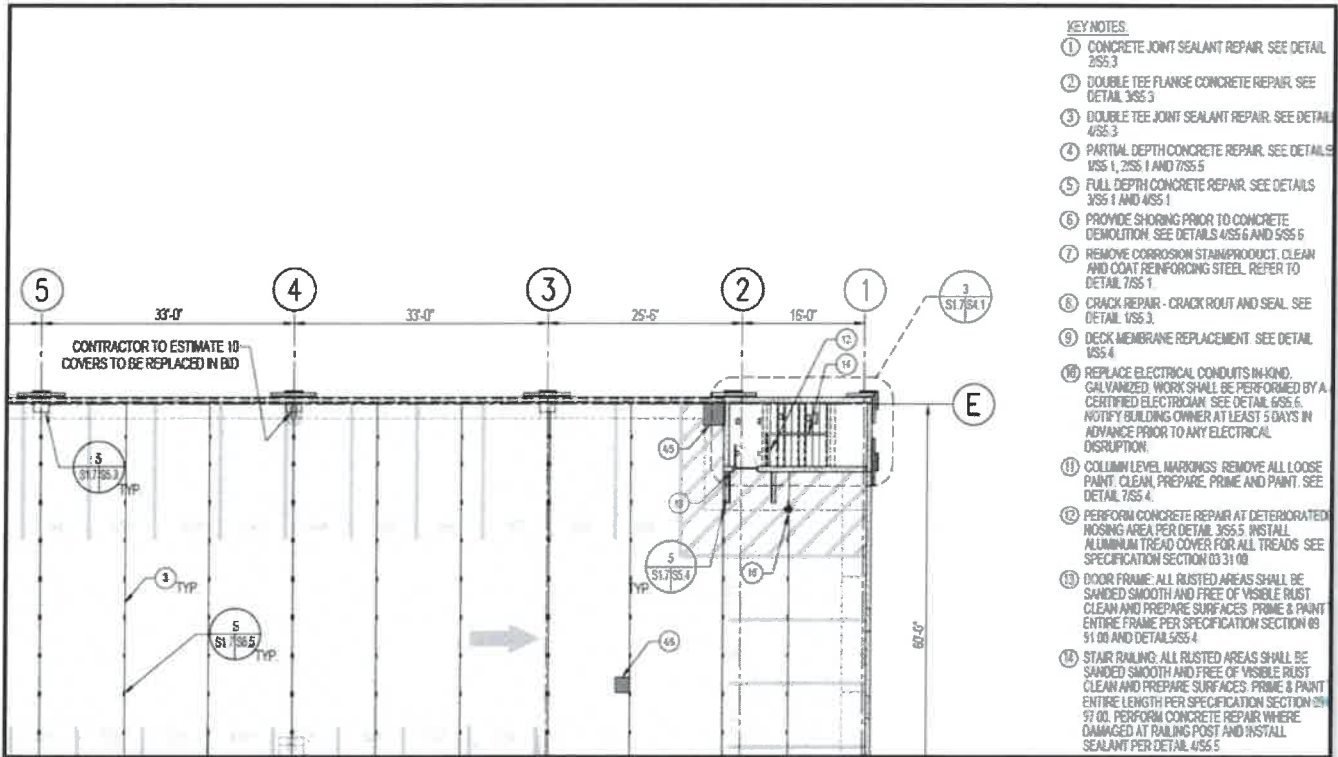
Partial Deck View, Building 13 Parking Garage Rehabilitation
